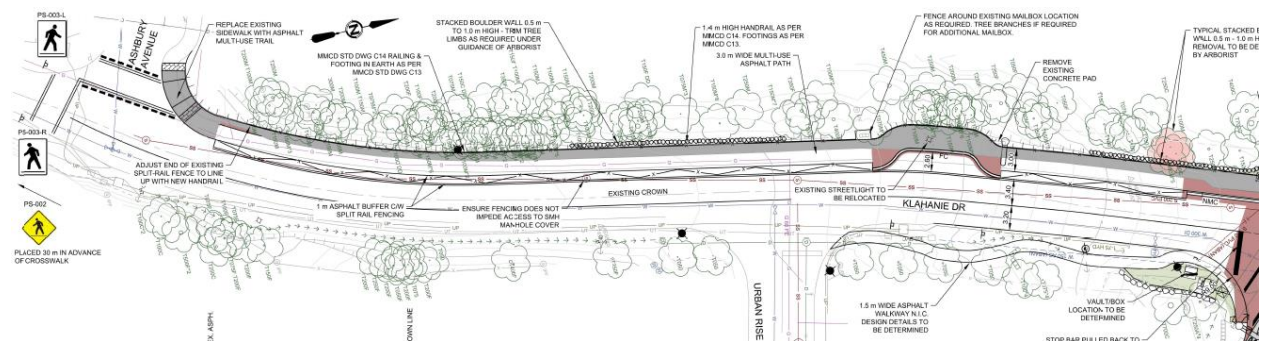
Klahanie Multi-Use Path Addition Plan View IFT Snippet
